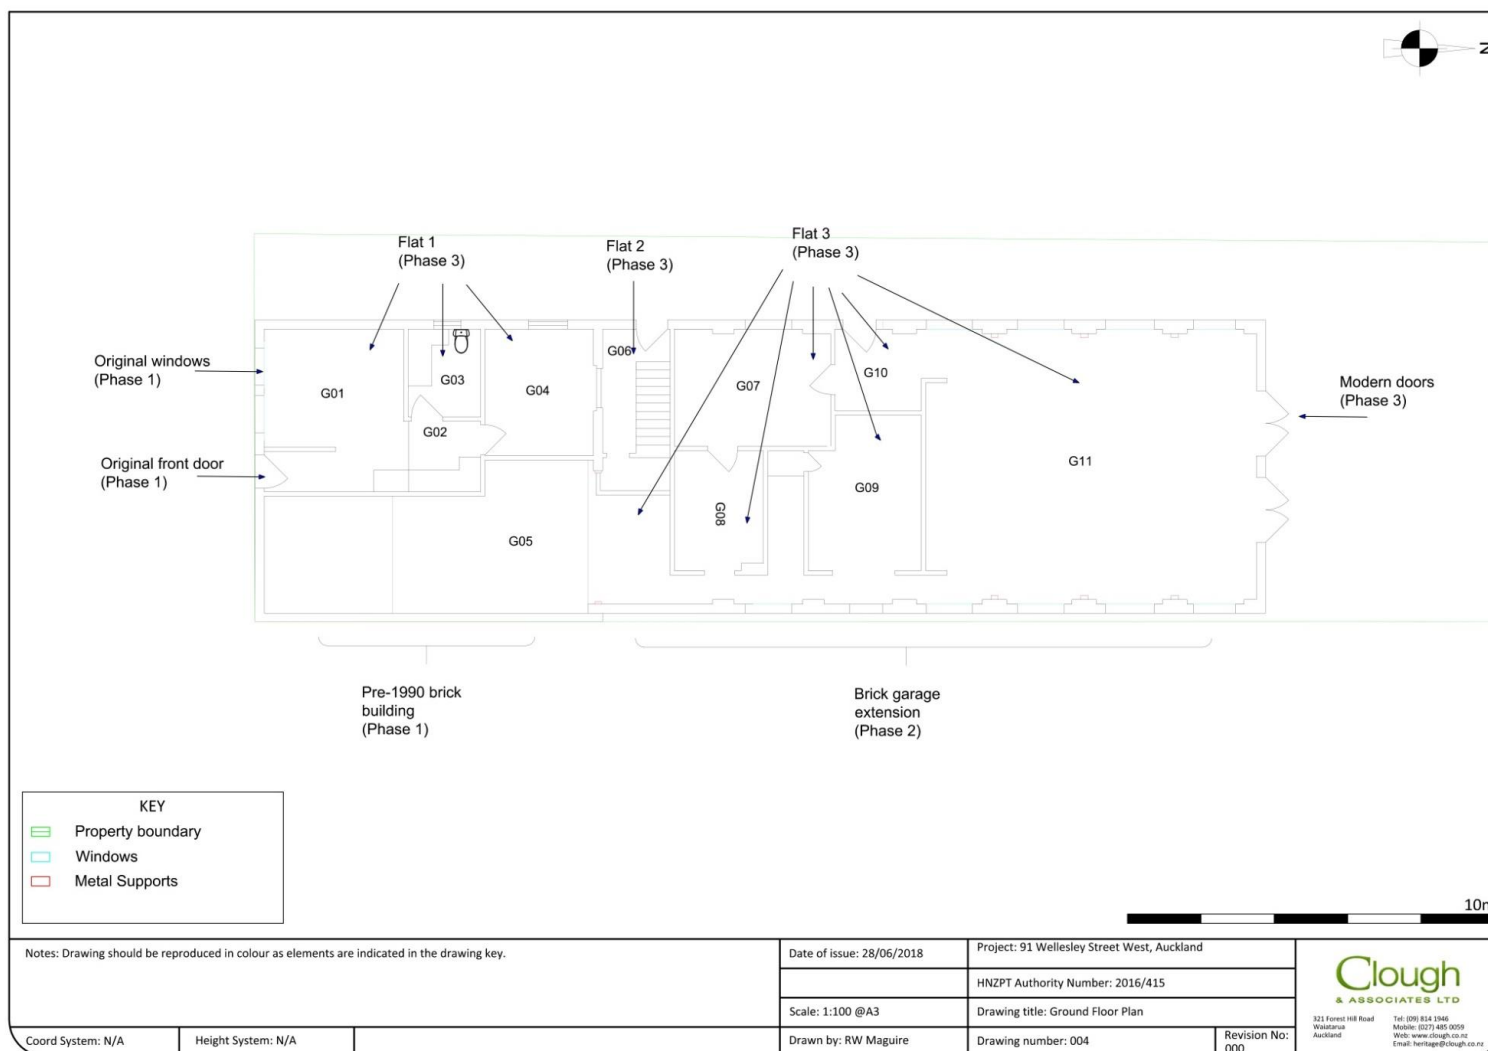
Ground floor plan of 83 Wellesley Street West (source: Clough & Associates, 2018)
